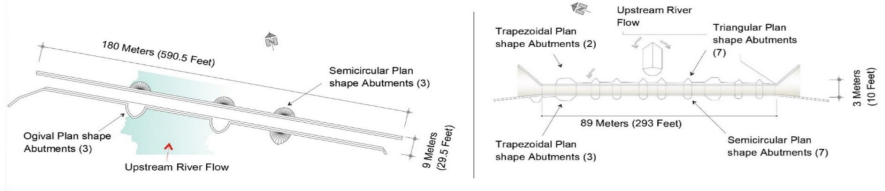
Left, plan of Las Donadas Bridge, Montoro Spain. Source (Author 2020) Right, Plan of Los Esclavos Bridge, Santa Rosa, Guatemala. Source (Author 2020)
